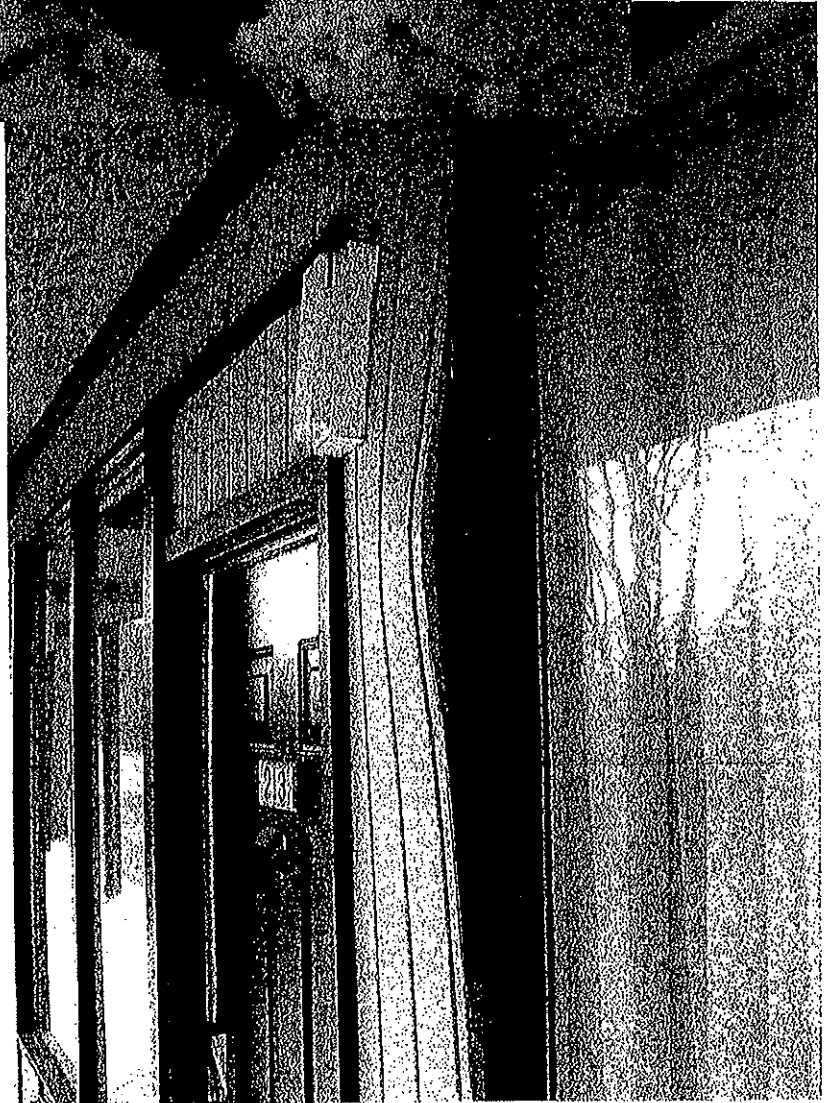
Bowed T1-11 Siding Between Door and Window of Wild Goose Lodge Unit
